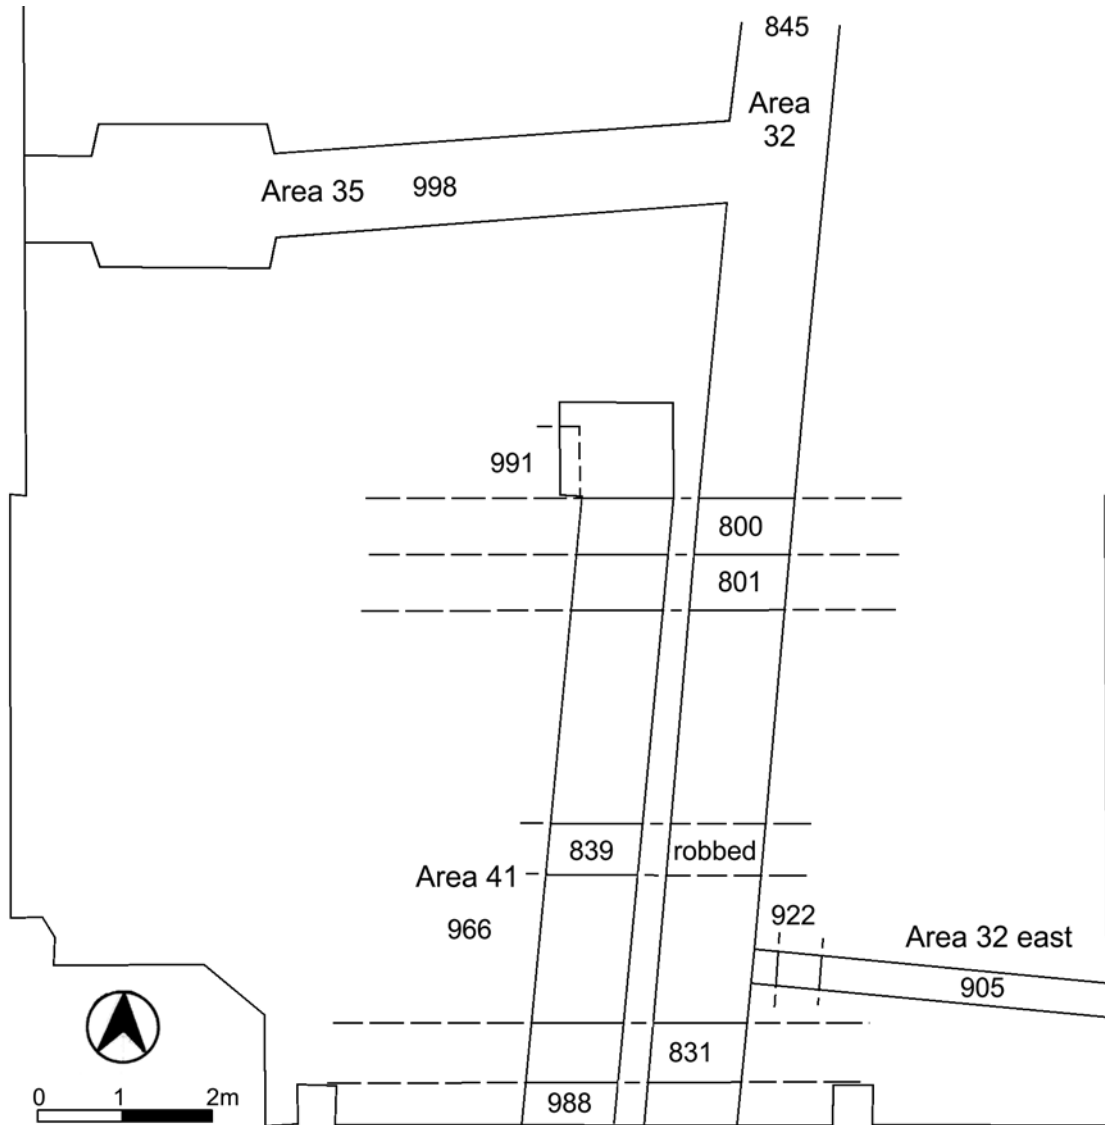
Areas 32 and 41, plan showing the footings of the south wall of the church
